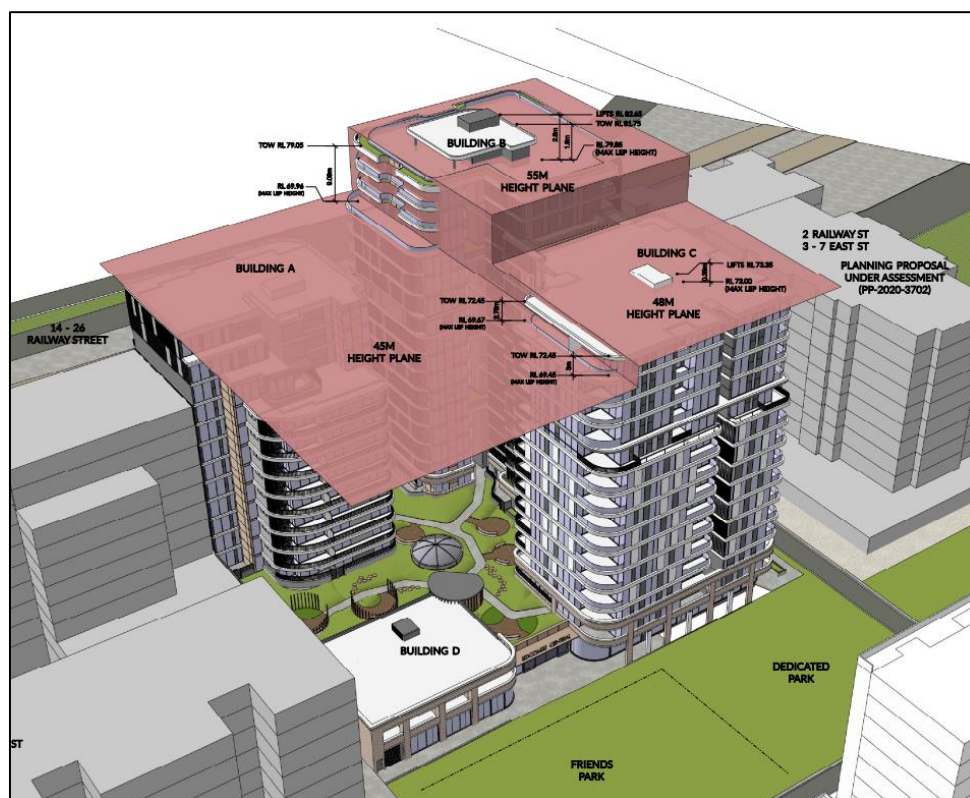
Extract of proposed Height Plan Diagram (Source: Loucas Architects, 2021)
